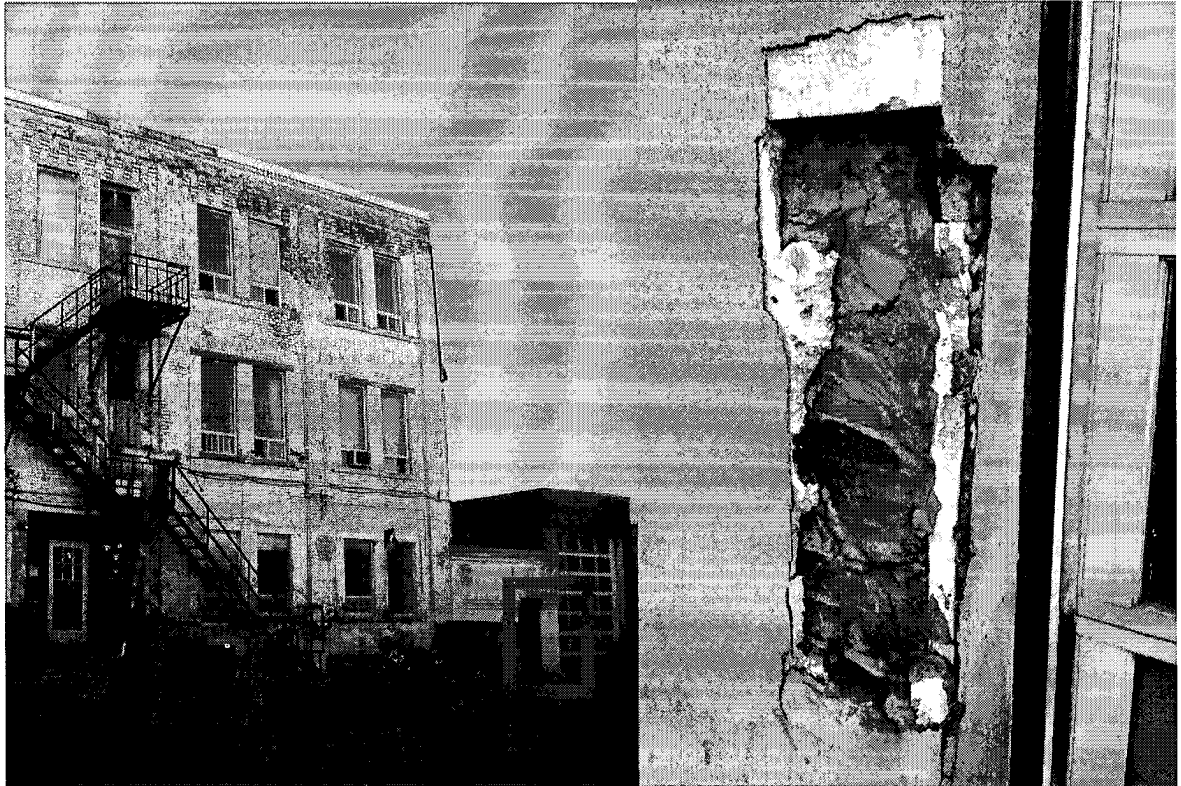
West facade of Jefferson Ave located beside overhead door of existing auto repair shop with a portion of stucco damaged by impact. Original brick facade is visible below the stucco and insulation, a portland cement patch covers the area of exposed brick revealed by car impact.
